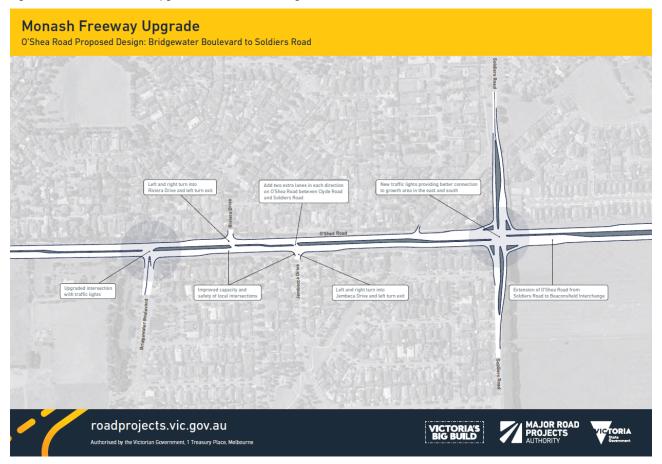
O'Shea Road Upgrade and Extension – Wordsworth Drive to Beaconsfield Interchange
